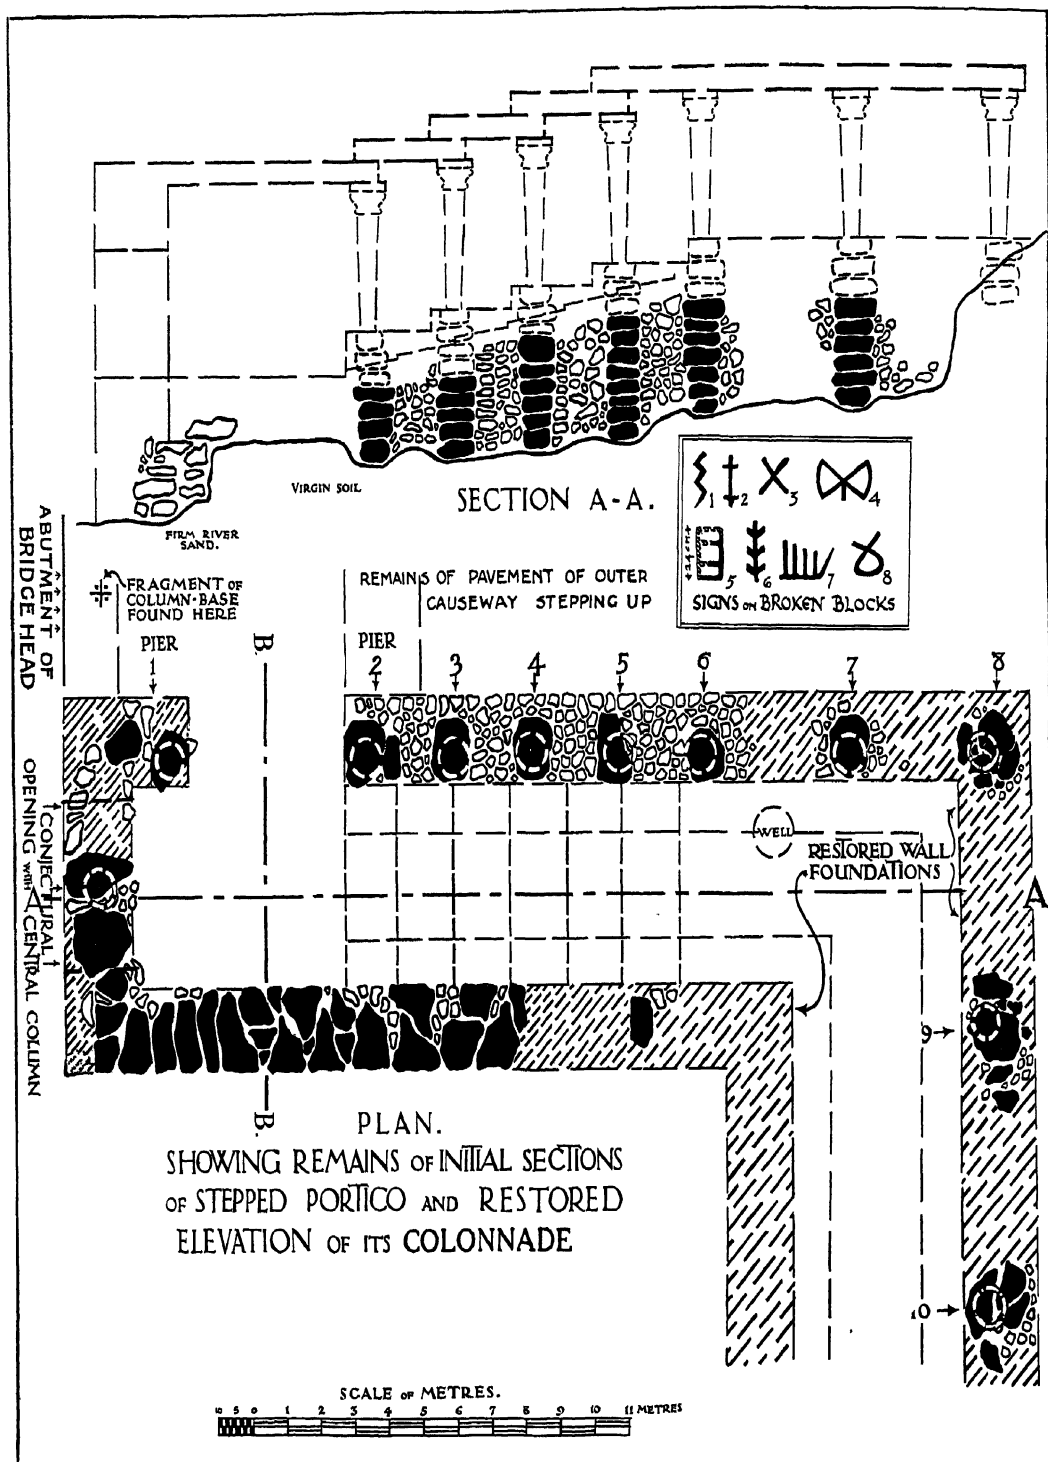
PLAN AND SECTION OF REMAINS OF INITIAL SECTIONS OF STEPPED PORTICO.
